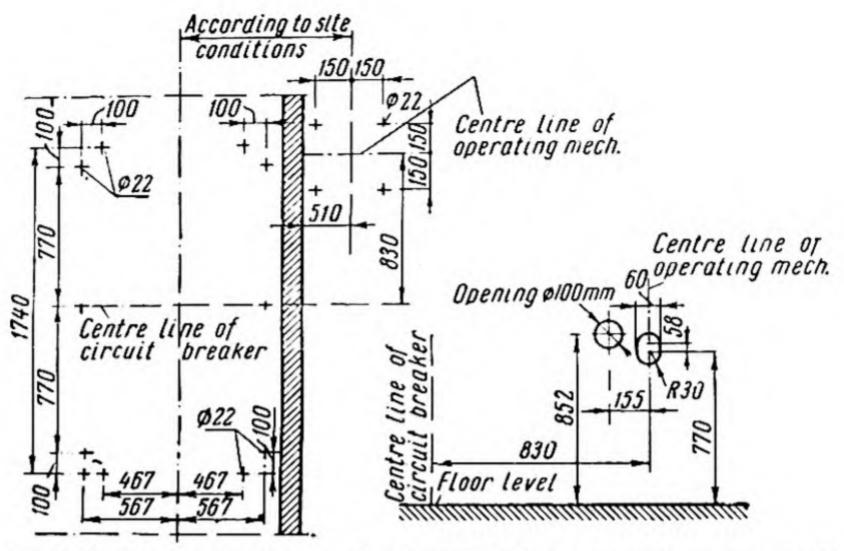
Layout drawing for mounting of a MΓΓ-299 circuit breaker and its IIC-30 solenoid operating mechanism
